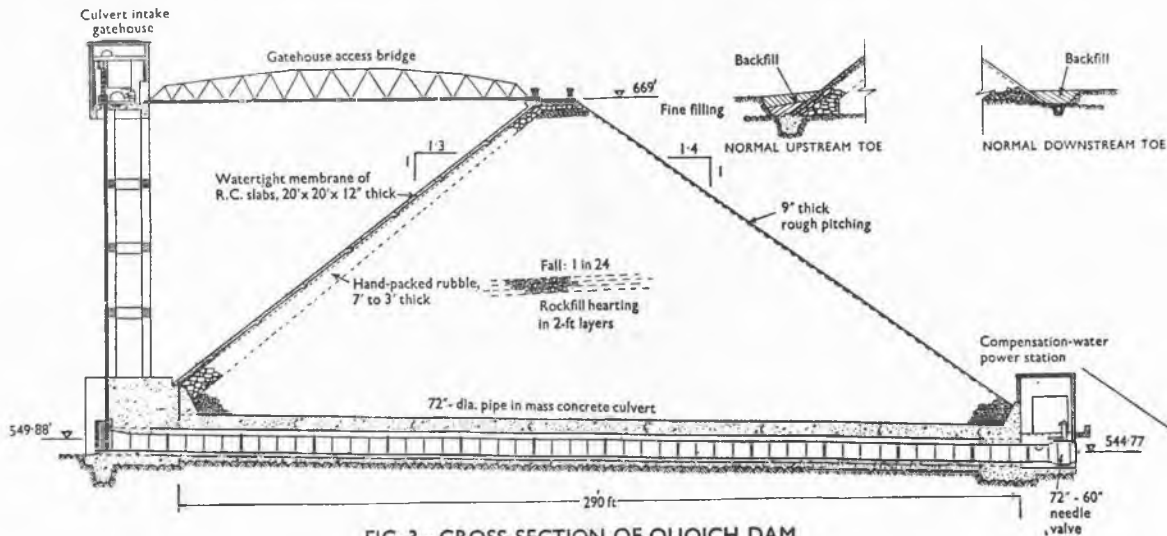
CROSS SECTION OF QUOICH DAM
